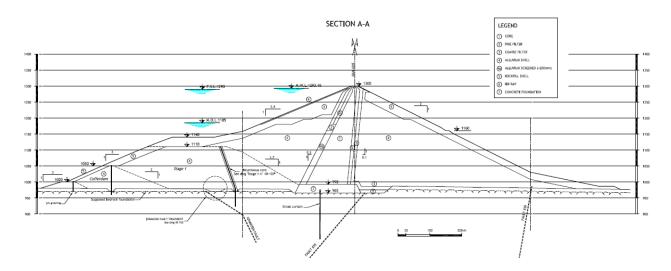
Dam Cross Section. Alternative FSL=1,290 m.a.s.l.
